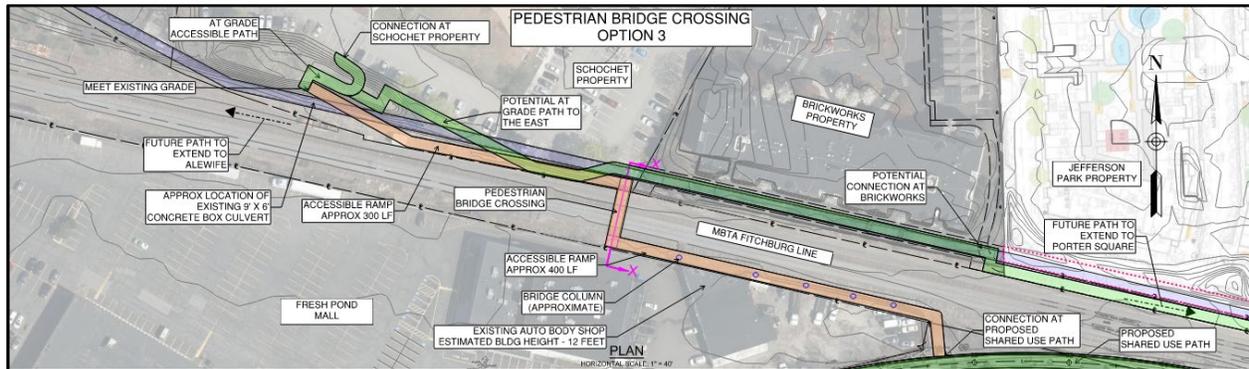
Pedestrian & Bicycle Bridge Crossing Concept 3 – Plan Diagram
